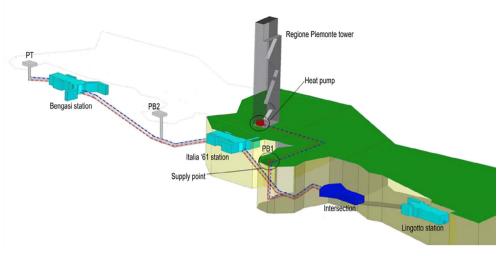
View of the Turin Metro Line 1 South Extension tunnel alignment and the proposed geothermal plant connected to the Regione Piemonte tower (Barla and Perino, 2014).
